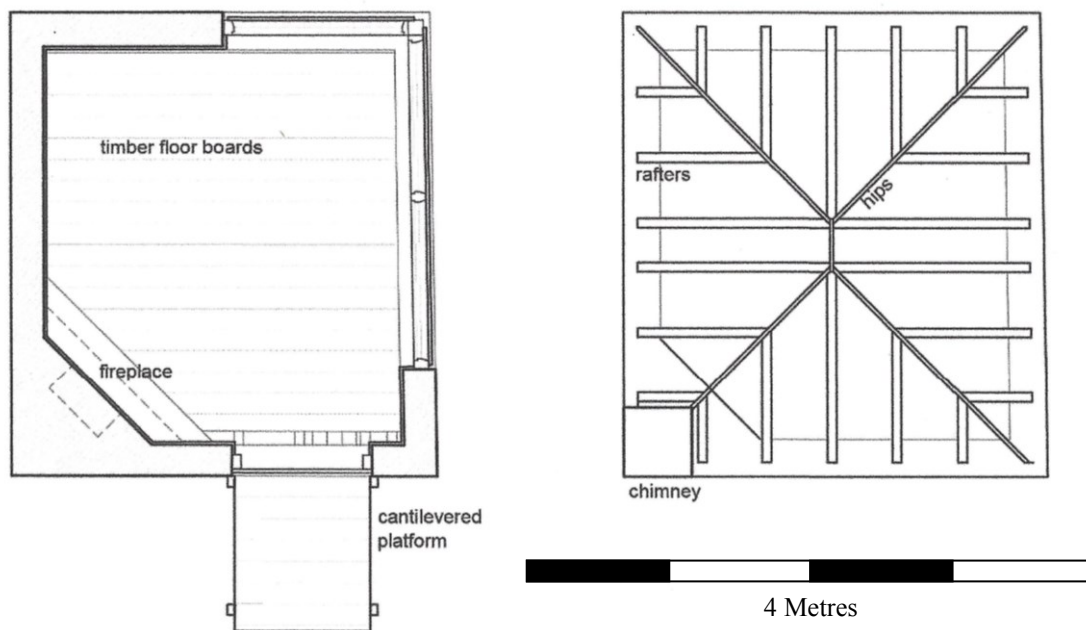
First floor (left) and roof timbers of the Brakeman's Hut (drawing by DA).
